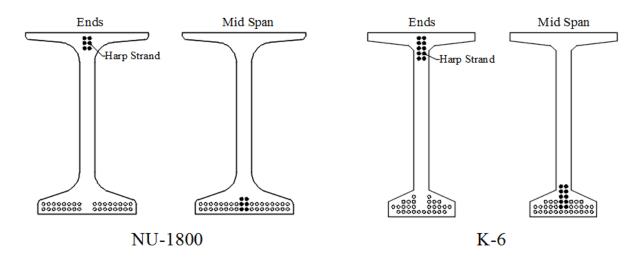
Comparisons of Girder Designs for Harped Strand Patterns with 130-ft Span Lengths
